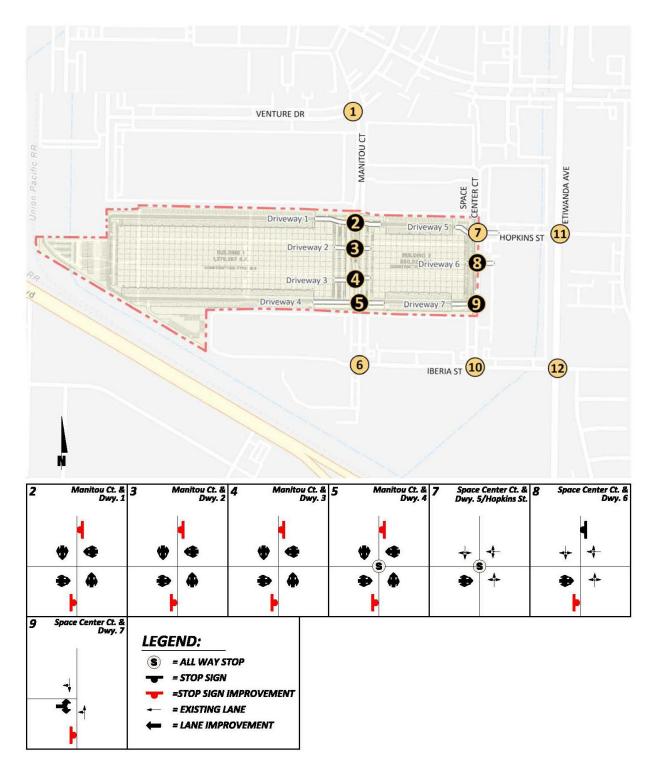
SITE ACCESS RECOMMENDATIONS
